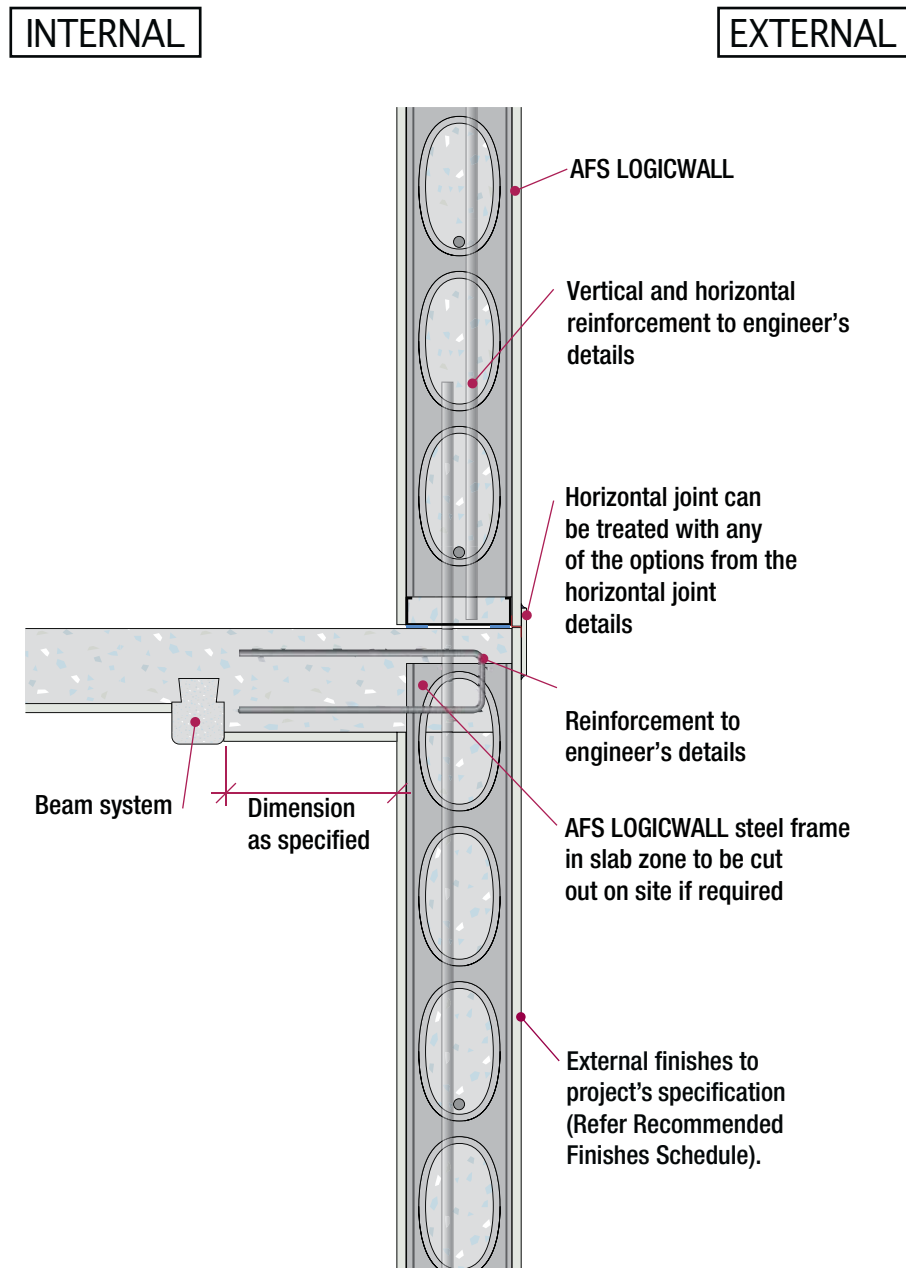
Wall Slab Junction, Beam System Perpendicular to AFS Logicwall®
